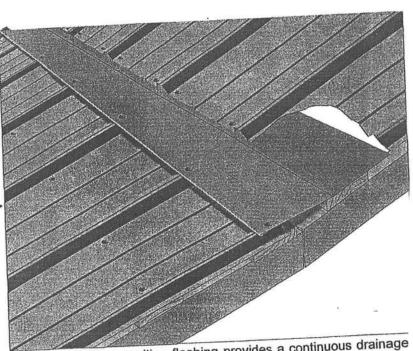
The transition flashing provides a continuous drainage where two slopes meet.
